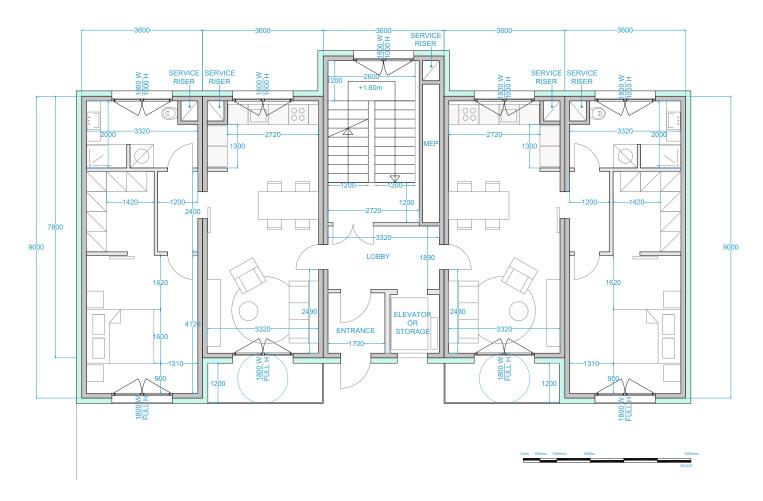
Plan form of building using 5 modules, one being a stairs/lift module
